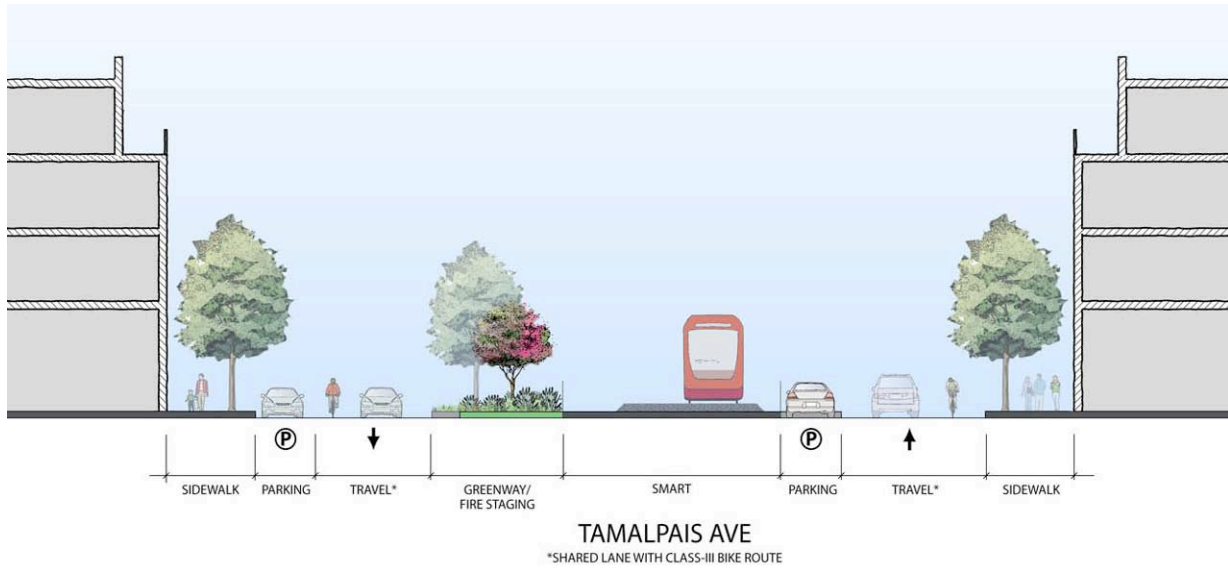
Potential concept for Tamalpais Avenue between Fourth Street and Mission Avenue
